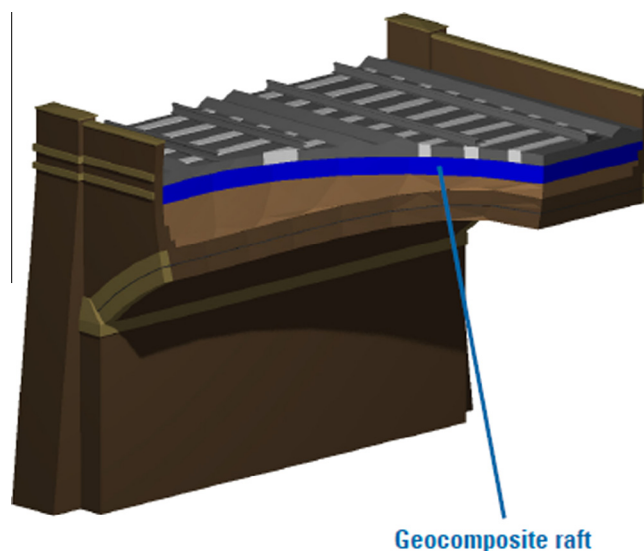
Masonry arch bridge with XiSPAN raft ([2]).
